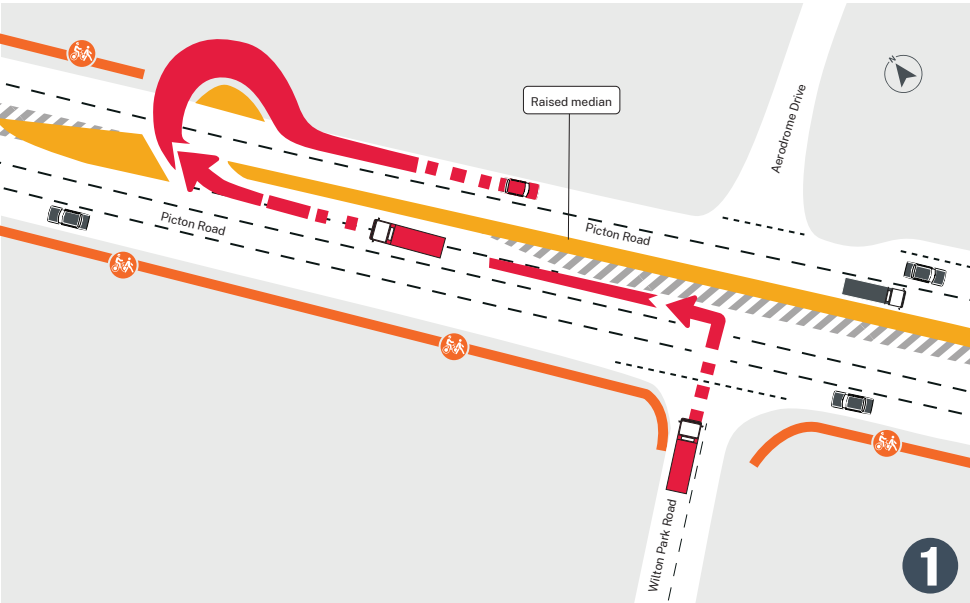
Vehicle U-turn facility west of Wilton Park Road intersection
